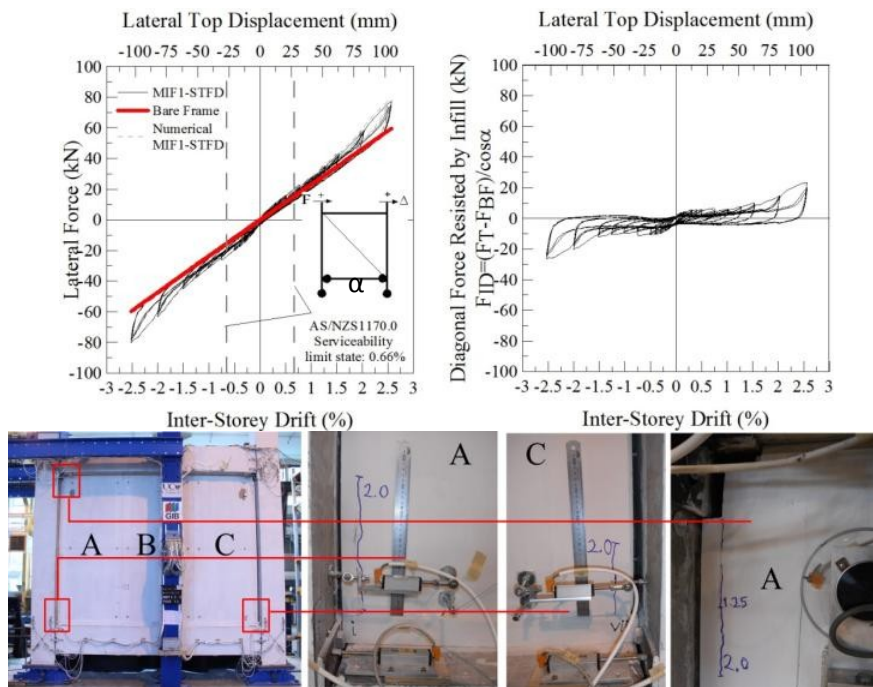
Hysteresis curve and corresponding diagonal force acting on the drywall for low damage steel framed drywall and observed damage at the end of test: Minor plaster crack (MIF1-STFD)
